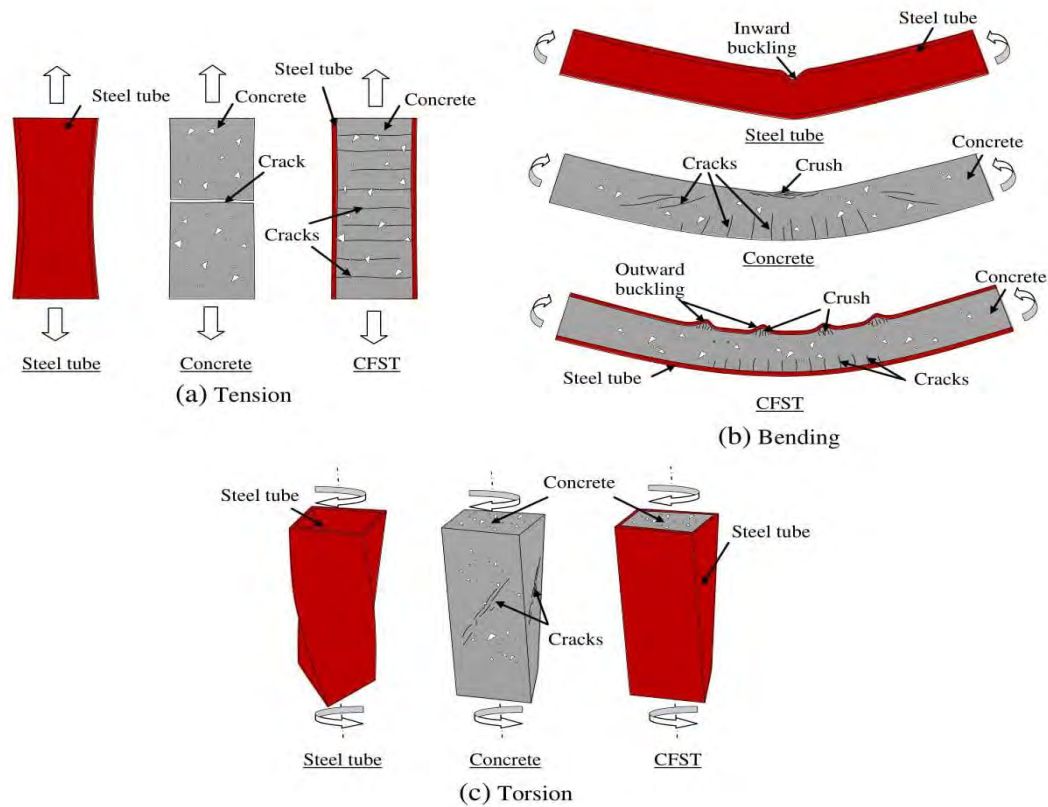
Schematic failure modes of steel tube, concrete and CFST under tension, bending and torsion (Ren et al., 2014)
